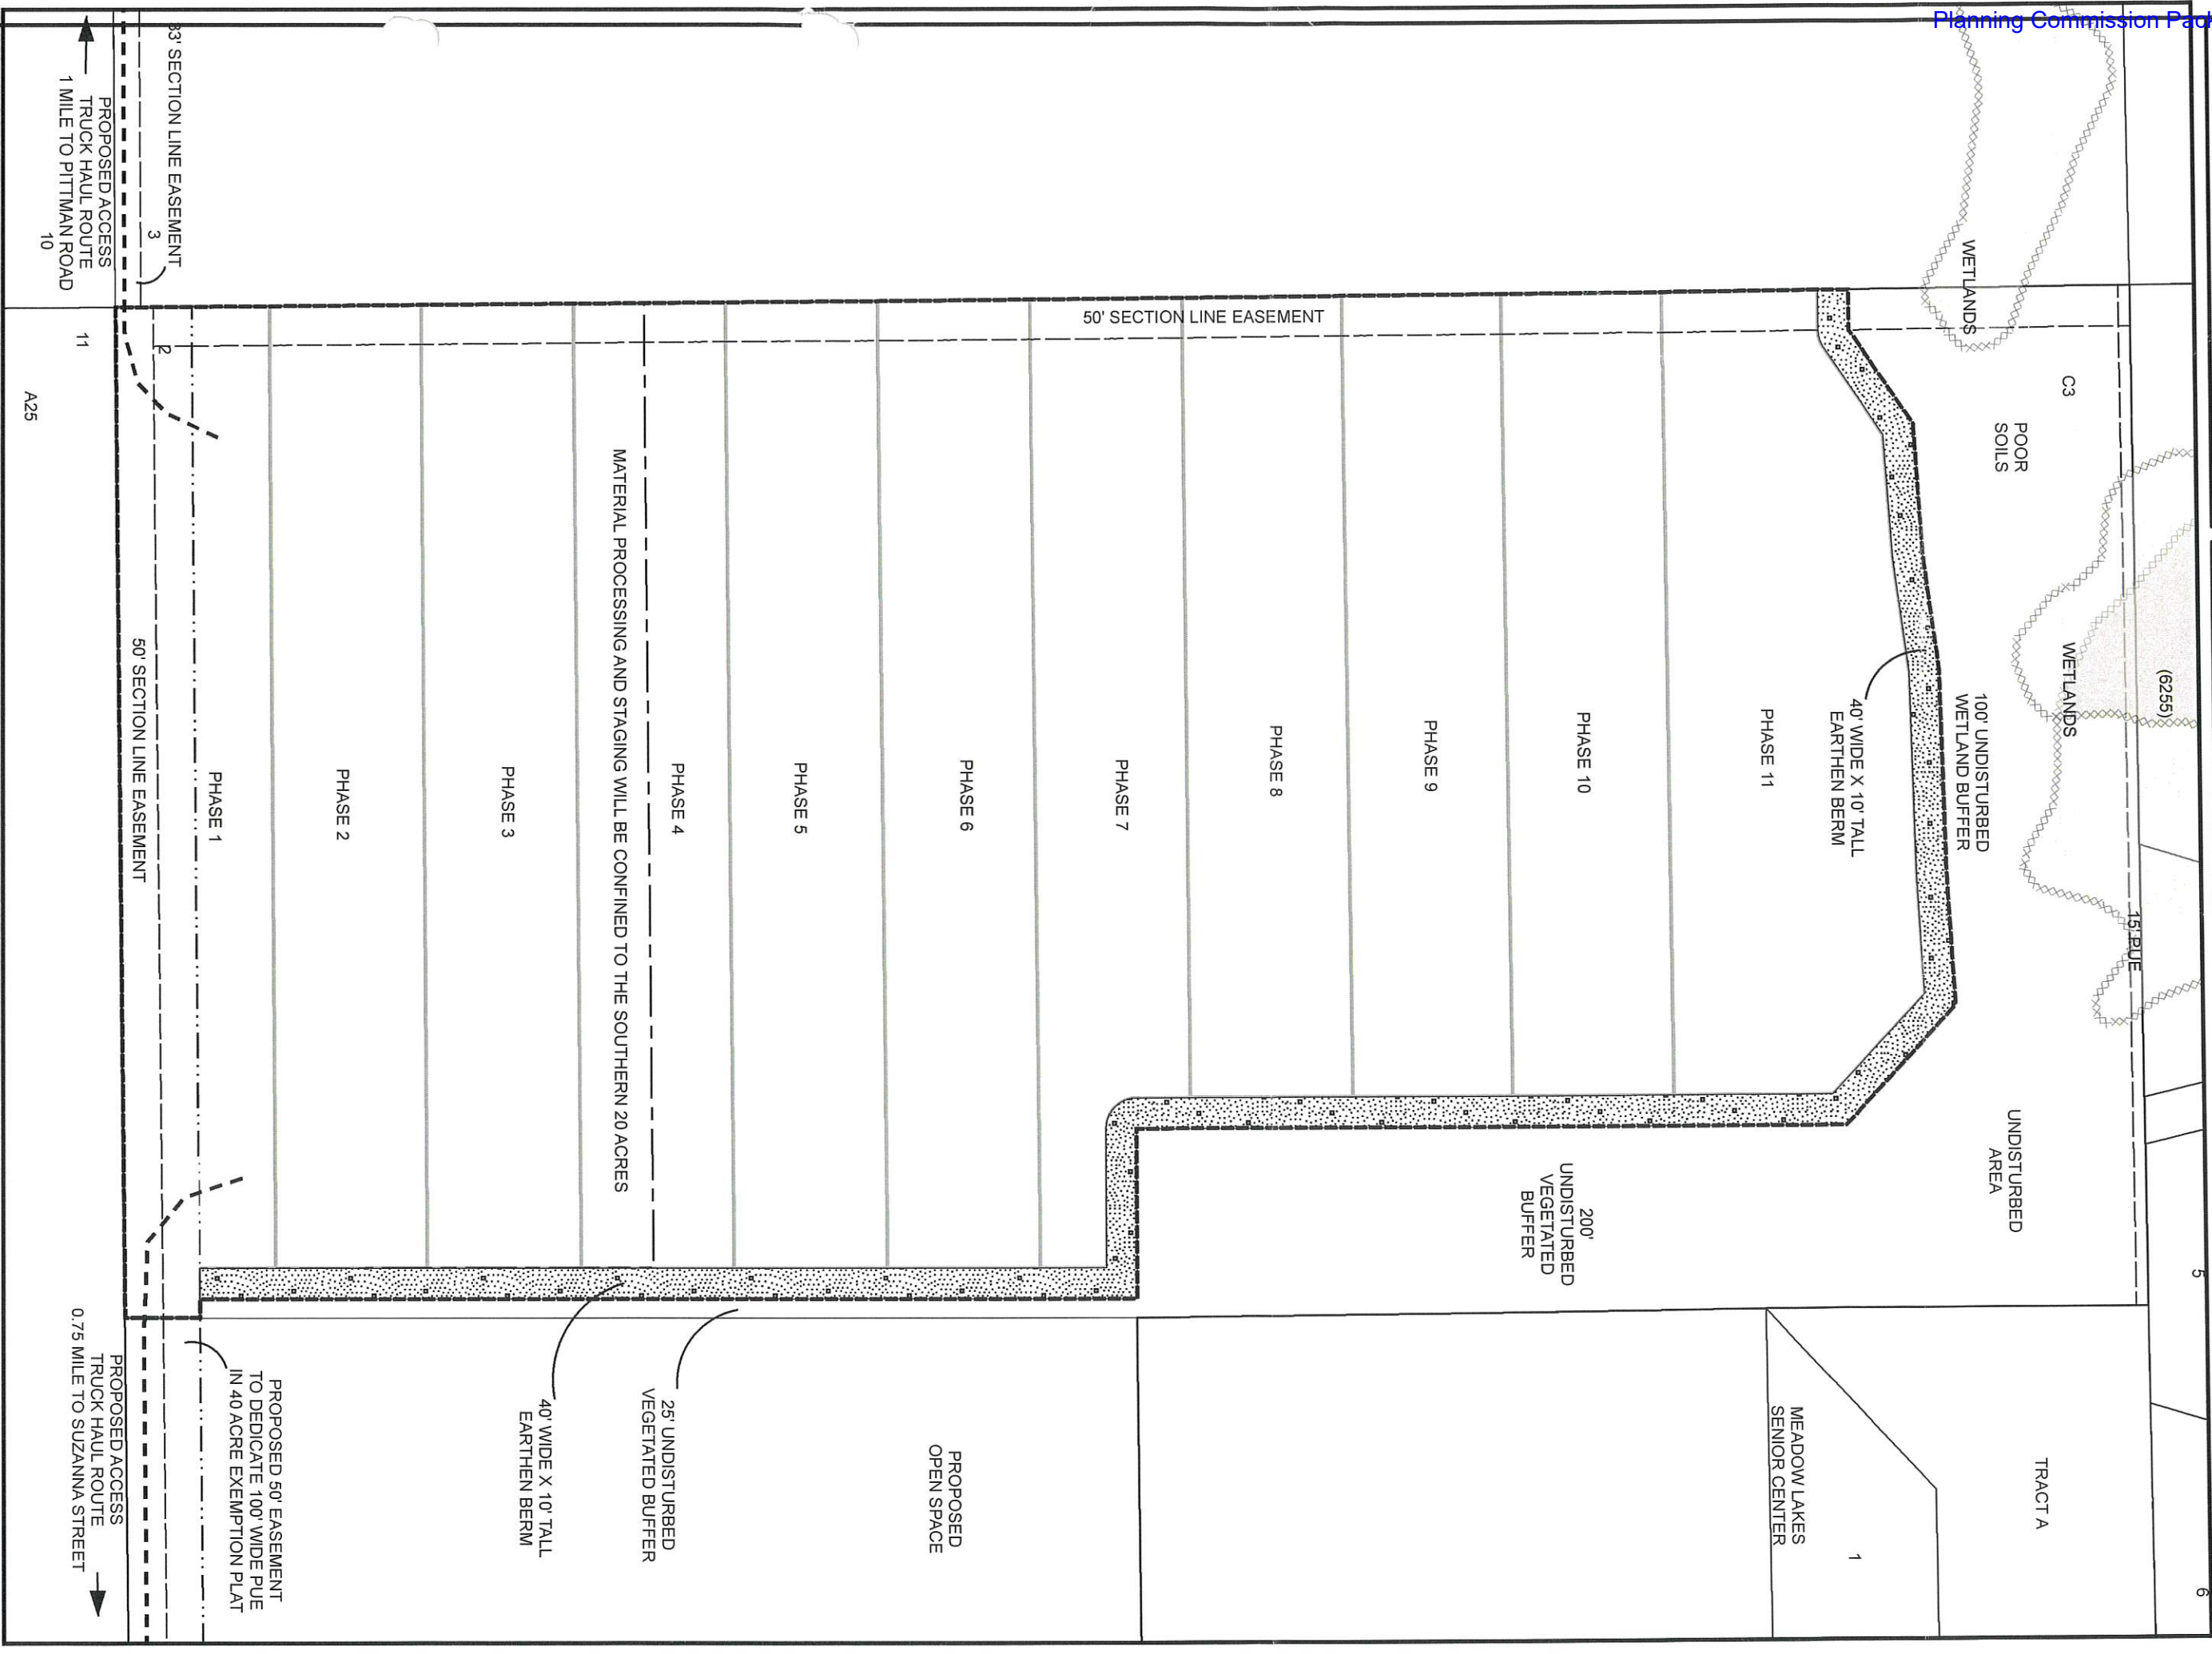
SITE PLAN LAYOUT 2
